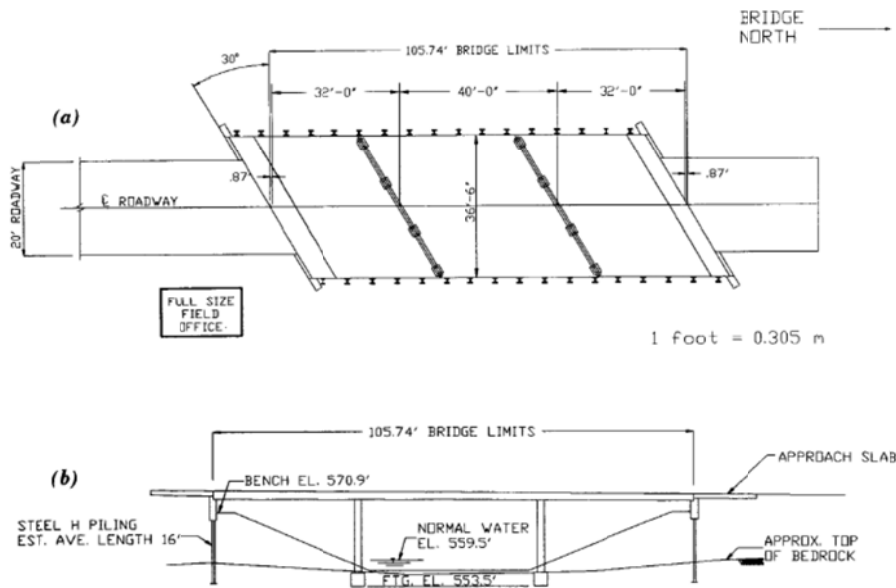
Bridge dimensions: (a) Plan; and (b) Elevation (Miller et al., 1994).
